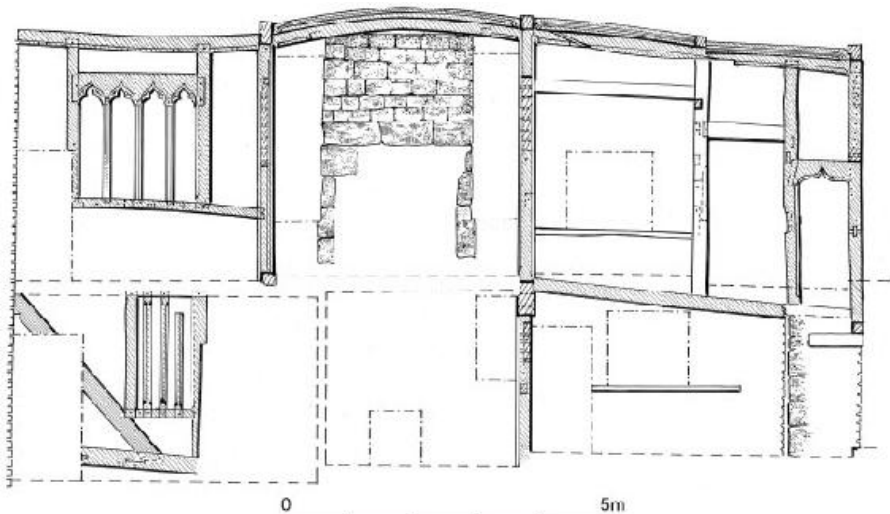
The interior face of the south frame of the hall of 20 Church Street as found, with original timber elements shaded. The frame had effectively had its back broken by settlement either side of the primary stack
